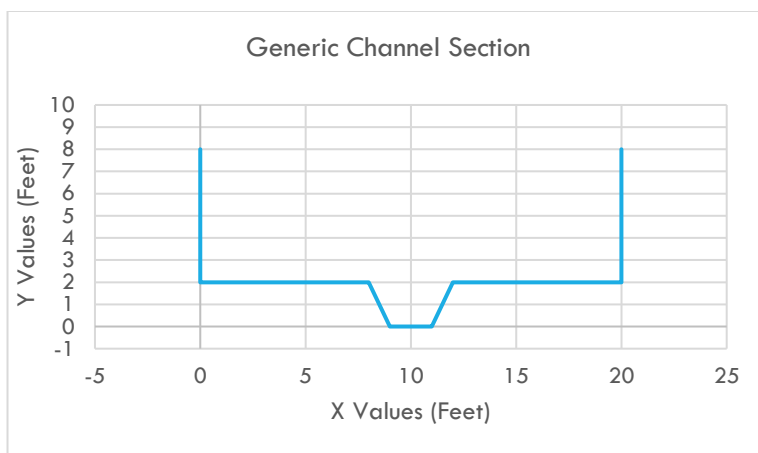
Generic Roadside Ditch Modeled Cross Section
